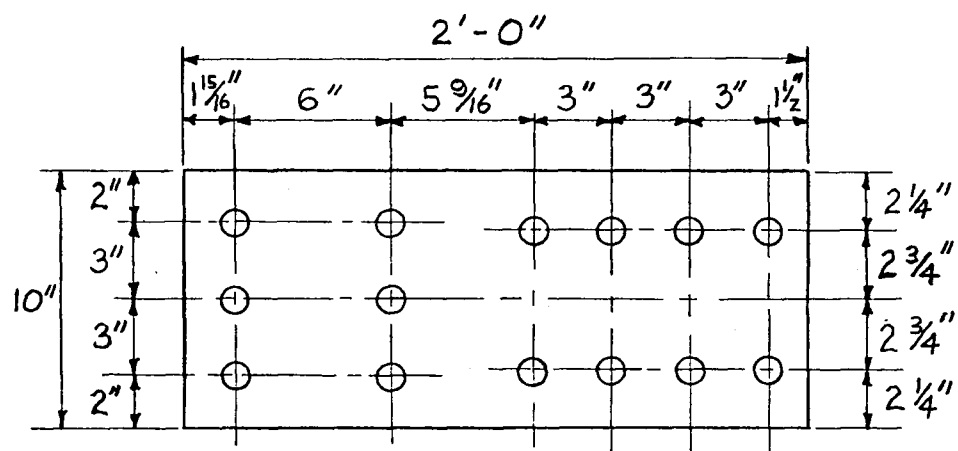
Tie Plate Detail at Floor Beam Bracket
